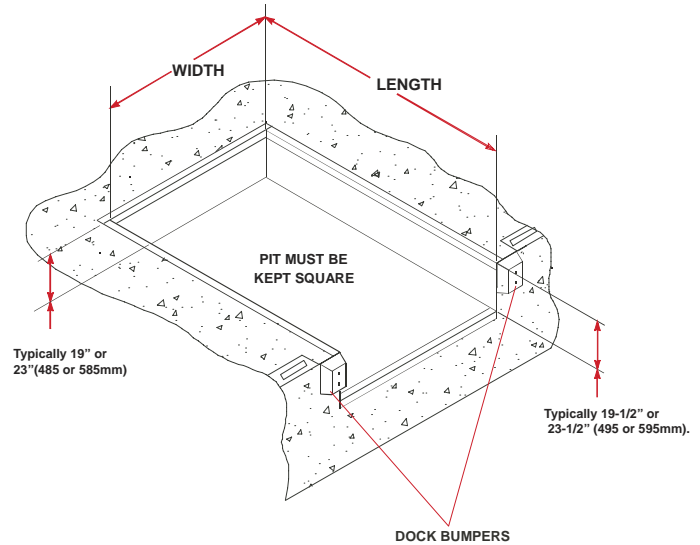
Pit Layout - Typical (Four piece curb angle shown)
